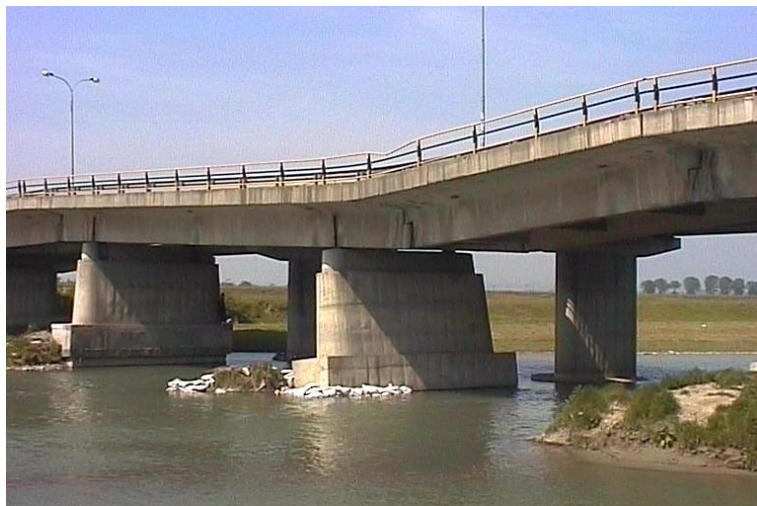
Pier no. 6 of the bridge over Moldova River, at Roman, which failed due to undermining
